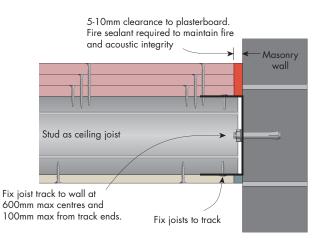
Fire Escape Tunnel Ceiling to Masonry Wall
